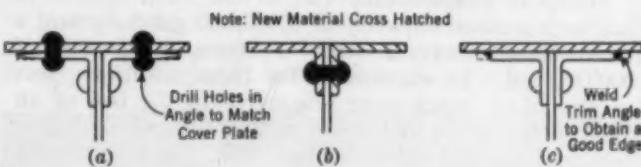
ALTERNATIVE REPAIRS TO CORRODED FLANGE ANGLE
